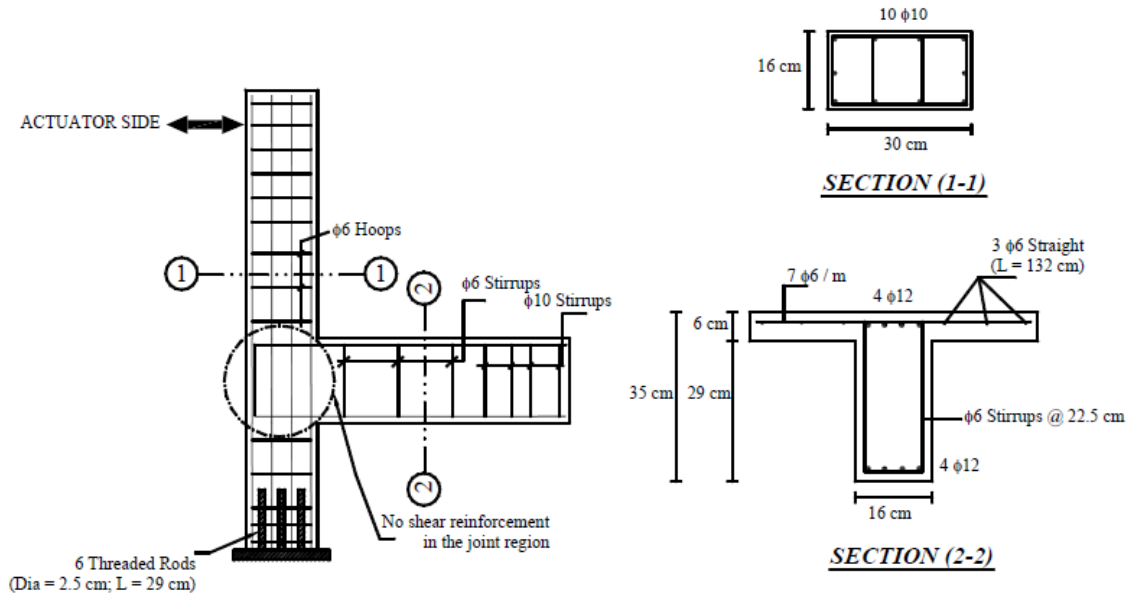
Reinforcement details of the As-Built specimen [Alsayed, Al-Salloum et al. 2010]
